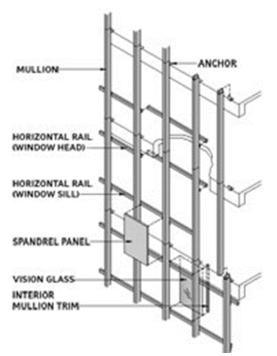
Stick-System Curtain Wall Installation and Fabrication (Paterson, 2011).
